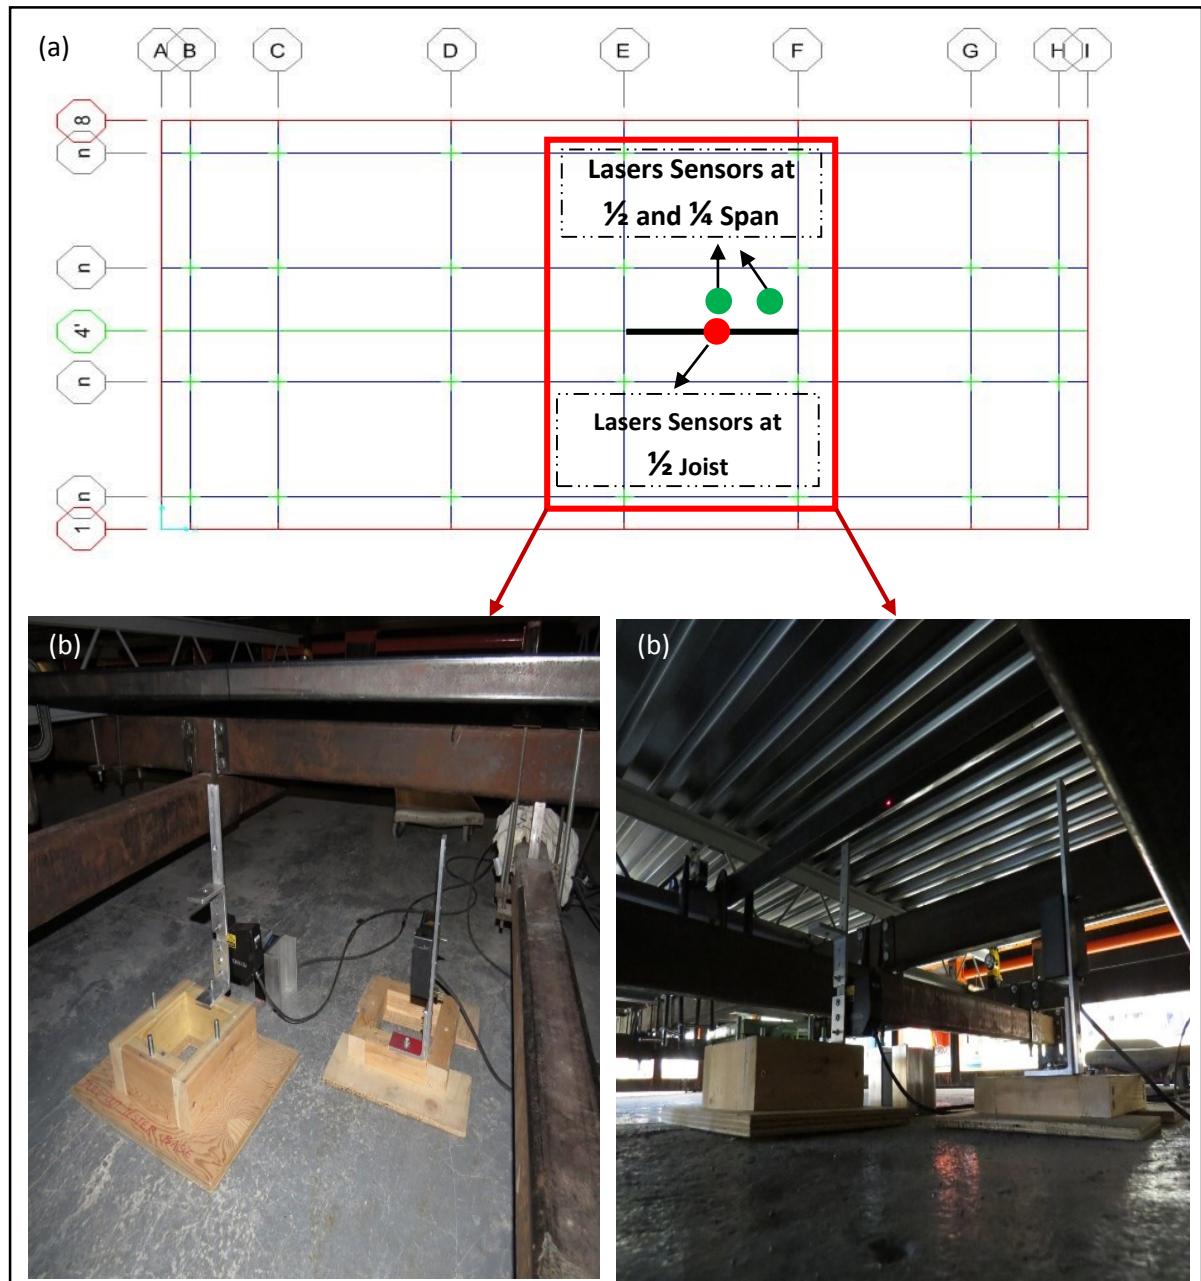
a) Schematic of the testing chamber and the laser locations, b) Installation detail of the lasers mounted underneath the steel deck and joists
